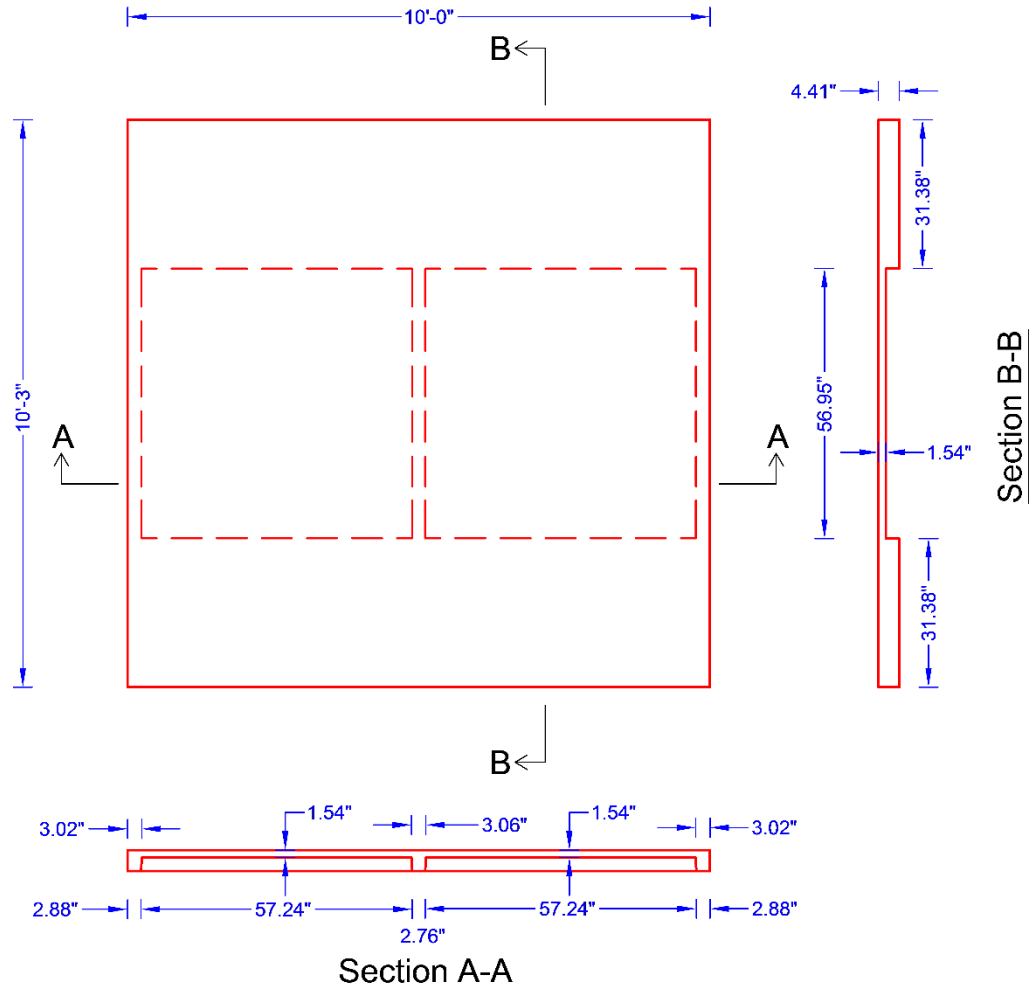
Schematic of the test specimen with two slab panels tested under uniform gravity loads. Additional stiffness was provided on two ends using thickened slab sections (from Park, 1971).
